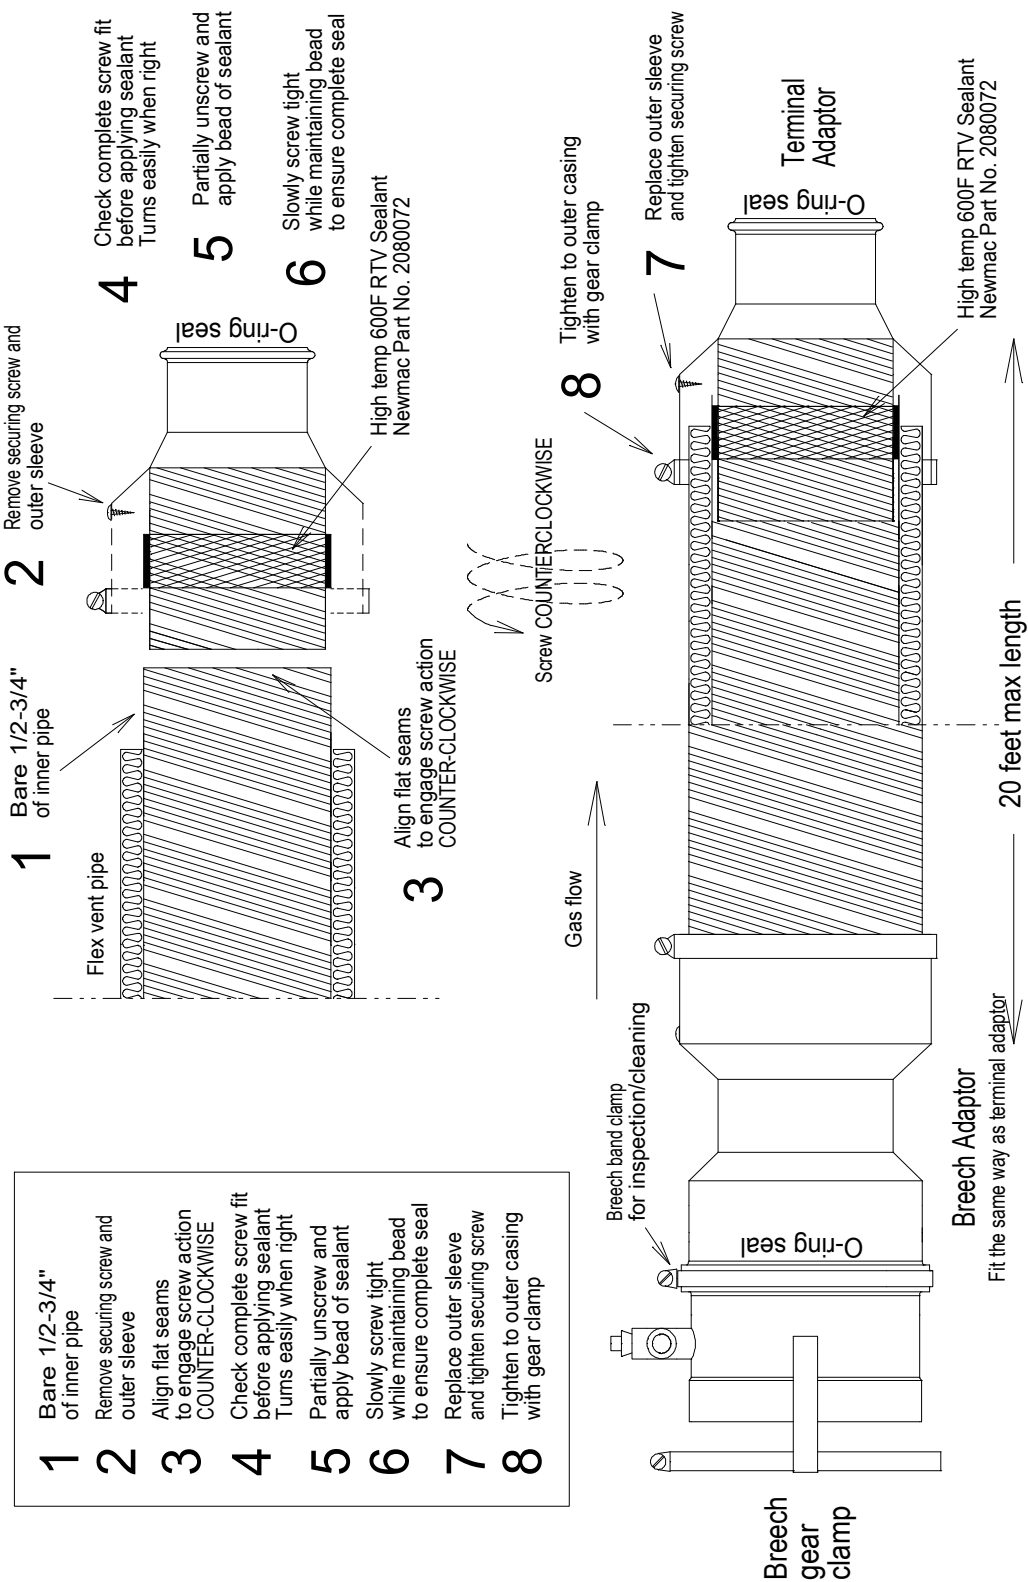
, FLEX VENT ADAPTOR ASSEMBLY
